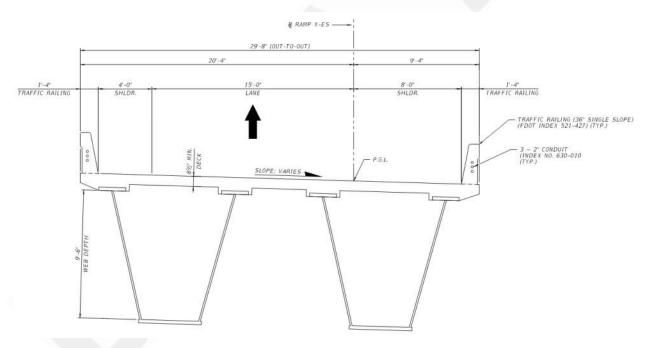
Bridge Typical Section (Bridge No. 4)
